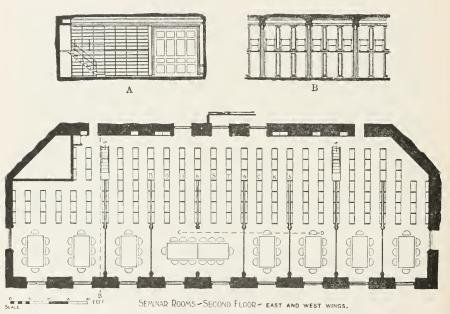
Columbia University. Plan of seminar rooms shown in figure 19. Λ, section through Λ B; B, section through C D.
